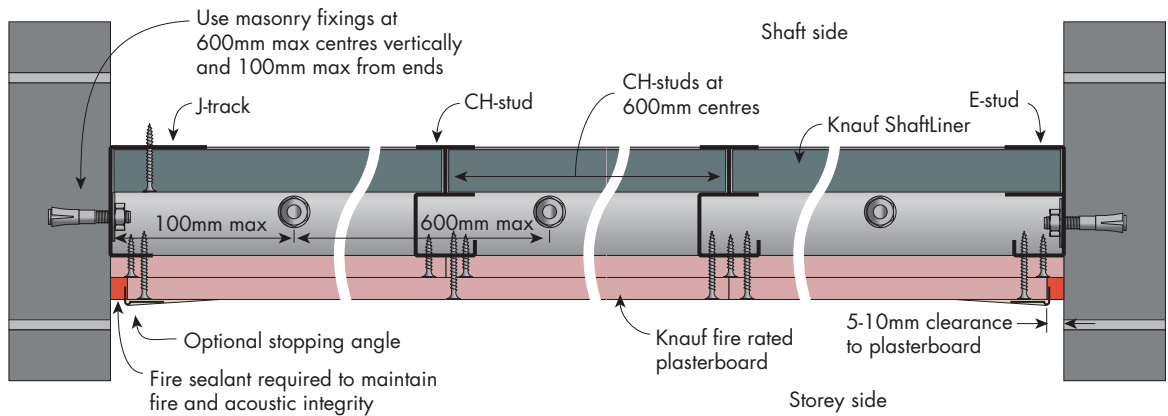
Butt Joint in Fire Rated Plasterboard Section
